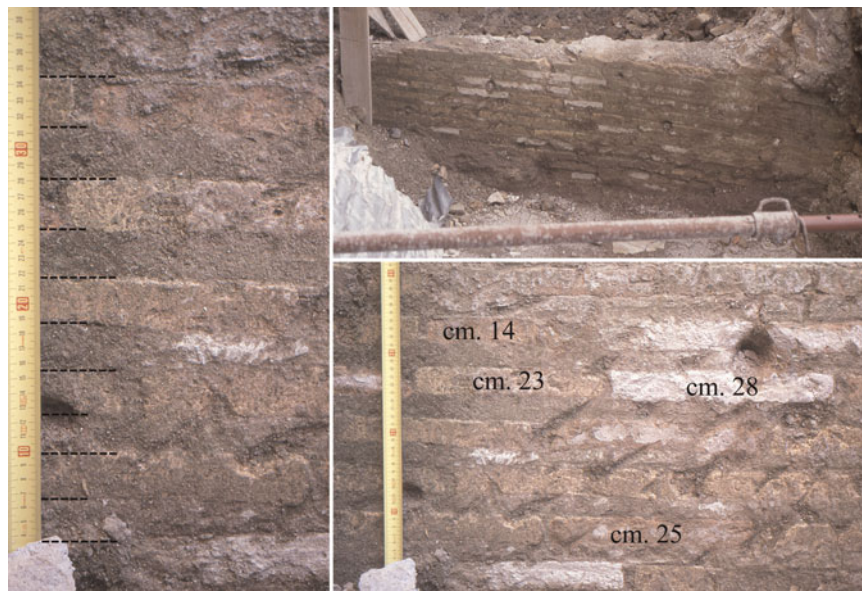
Left: the modulus of the brick facing of the building of Piazza delle Cinque Scole. Right: the wall of the building (above) and detail with the different lengths of the bricks (below). (Photos: author.)
